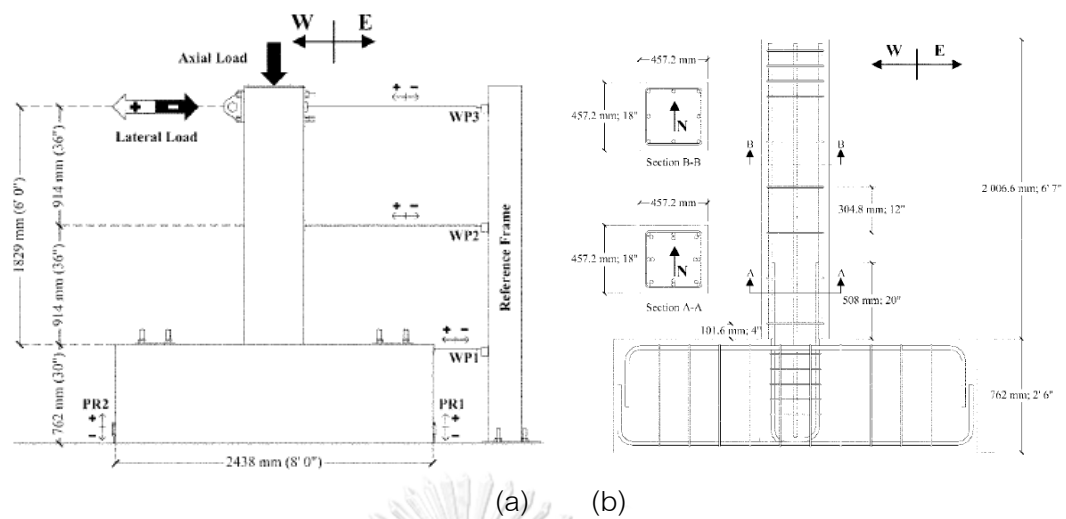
Cantilever column test setup (a) and Reinforcing details (b) [2]
